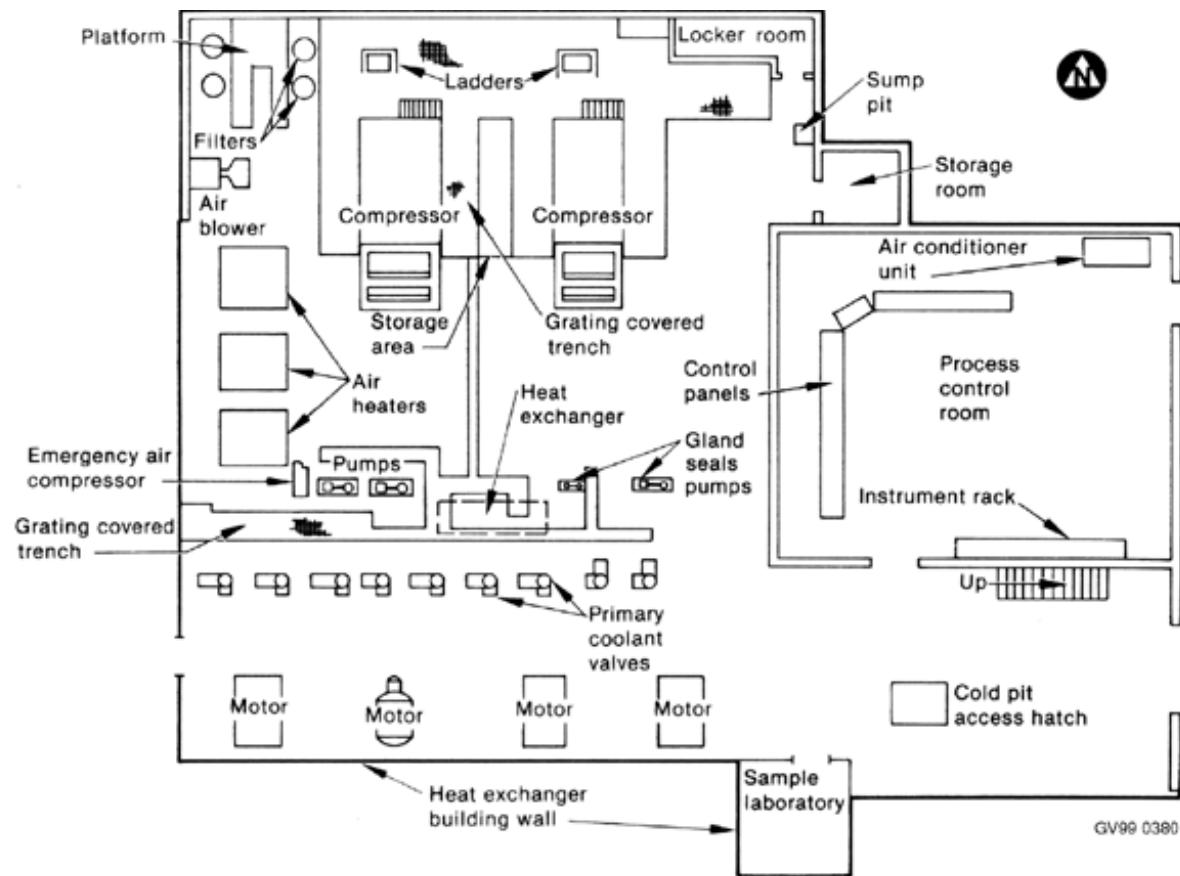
Floor plan of the ETR compressor building (TRA-643).
